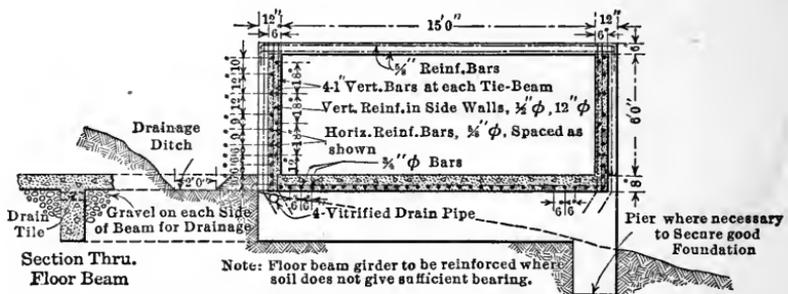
Reinforced concrete bench flume. Naches Power Canal, Wash.
